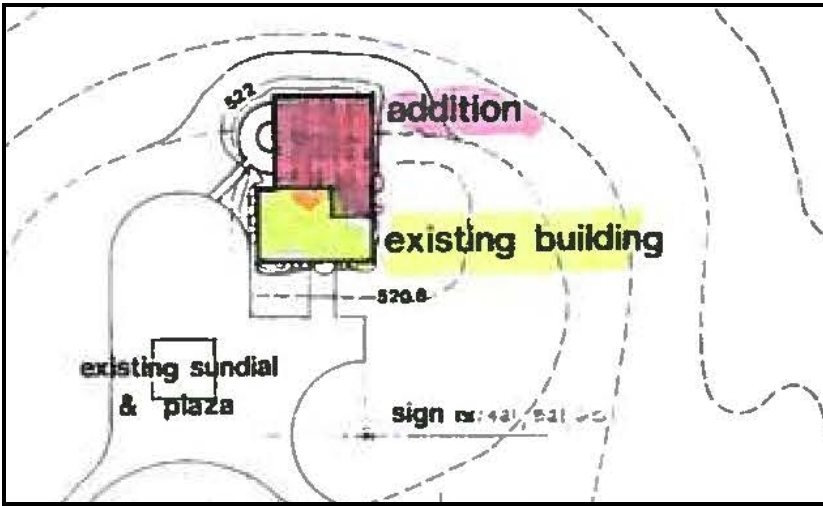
Site plan of addition. 1976. Photograph courtesy Aurora History Museum archives.
